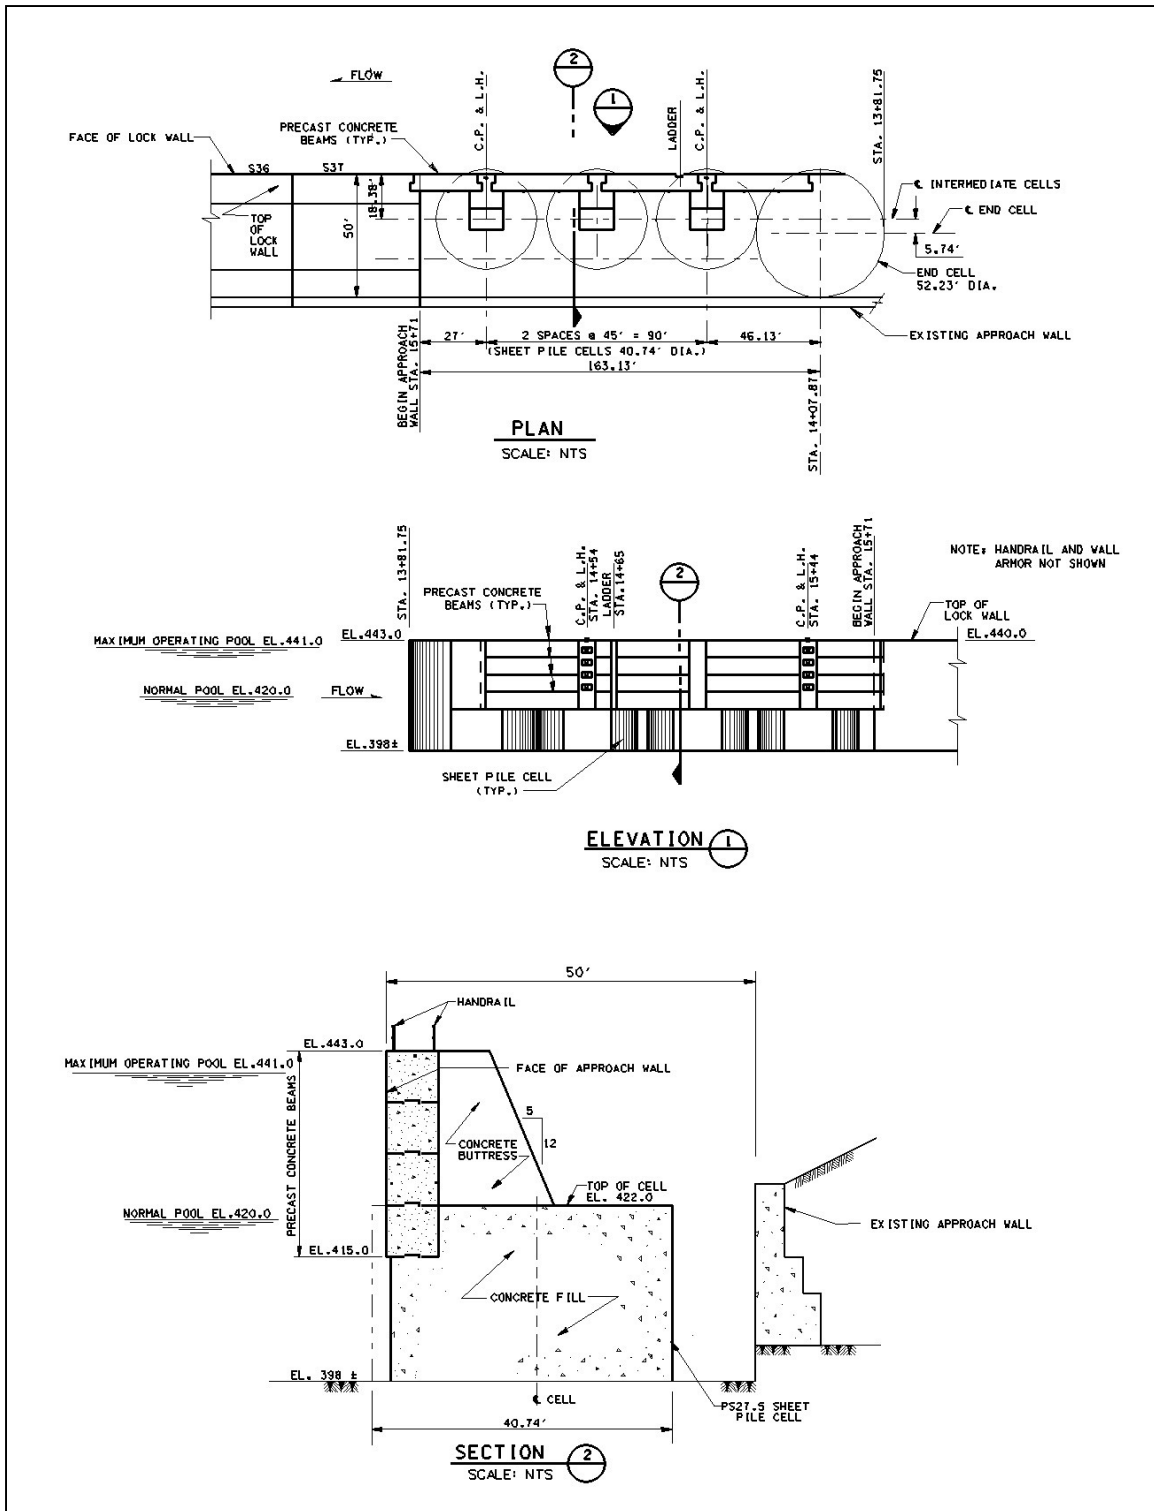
McAlpine Lock upstream approach wall. Substructure is a concrete-filled sheet-pile cell founded on bedrock. The cell is installed in the wet and is outfitted to receive the first precast beam. The concrete buttress is built in the dry and transfers barge impact loads to the substructure
